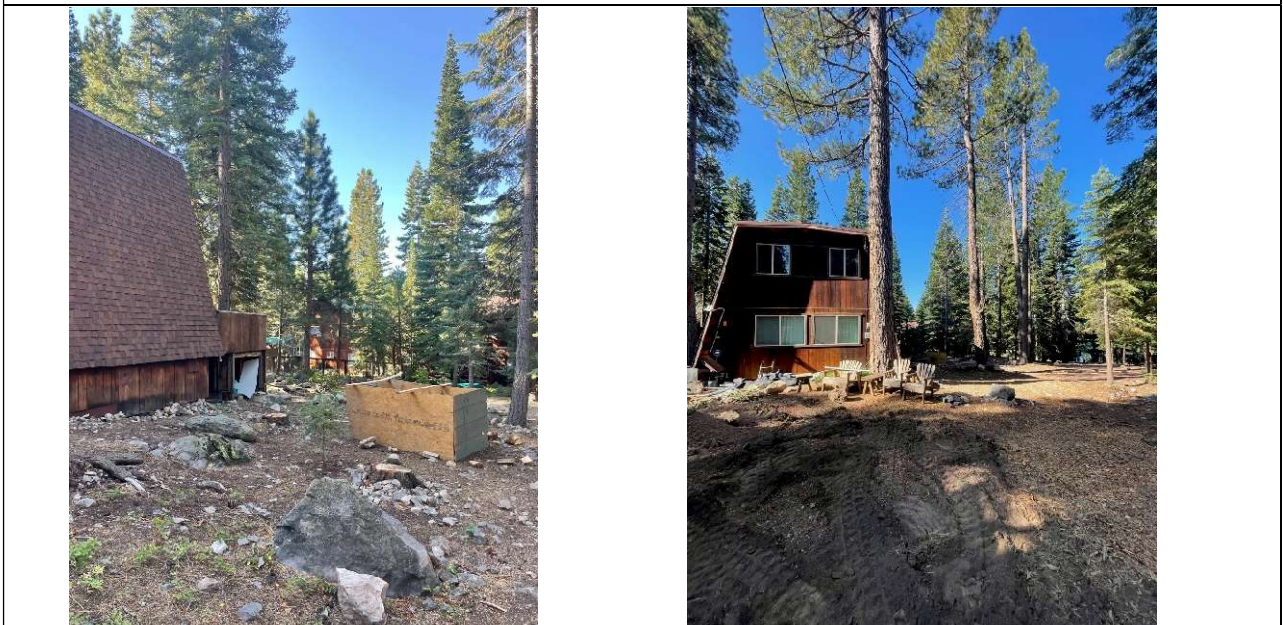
View from north to west/ back of parcel. Photo 2-b. Front of house from Rhodesia Road.
